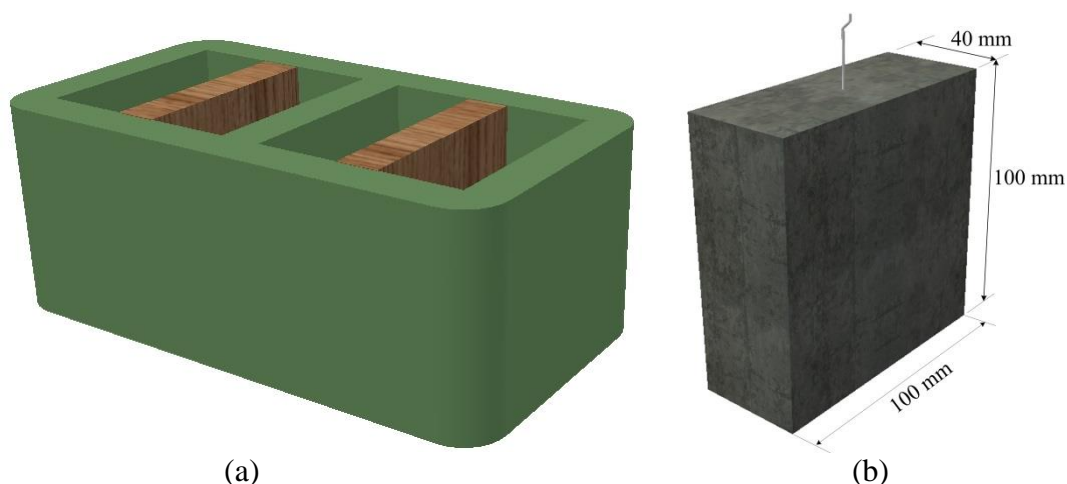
(a) Modified cube moulds to cast single fibre pull-out specimens, (b) the dimensions of the single fibre pull-out specimens
